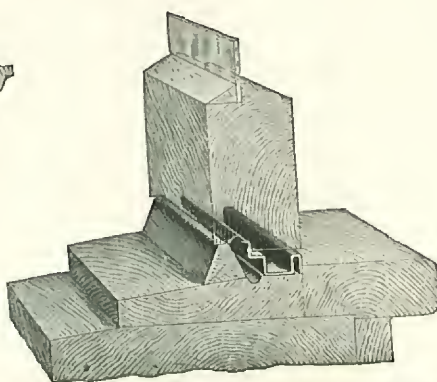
Cross-section thru sash and window frame at bottom showing installation of "AiR-Way" track below sash and the tight application of sash. Note arched groove in bottom of sash just back of wood threshold, or storm sill—this groove obviates the possibility of moisture following the bottom of the sash.
